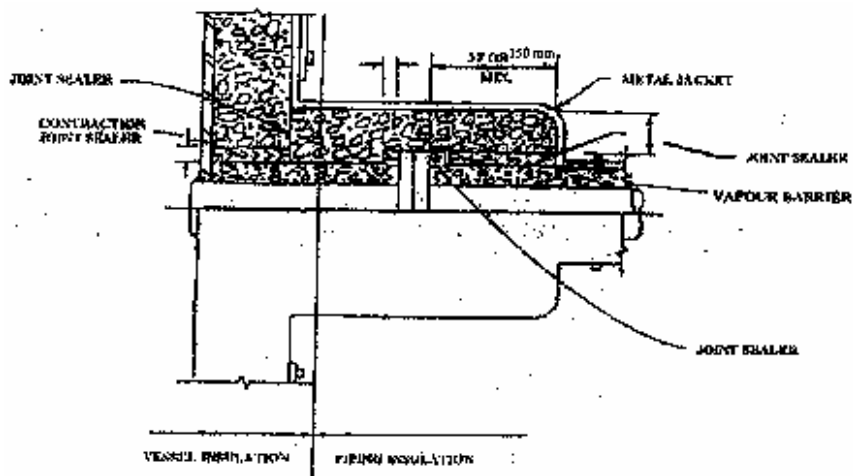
Typical vessel nozzle flange detail for Class C insulation
